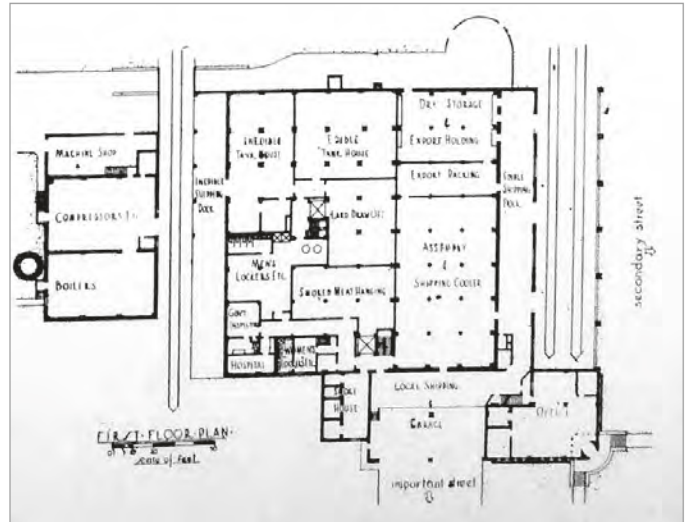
CANADA PACKERS PLANT, EDMONTON, ALBERTA, GROUND FLOOR PLAN. | JRAIC, 1937, VOL. 14, NO. 8, P. 159.
